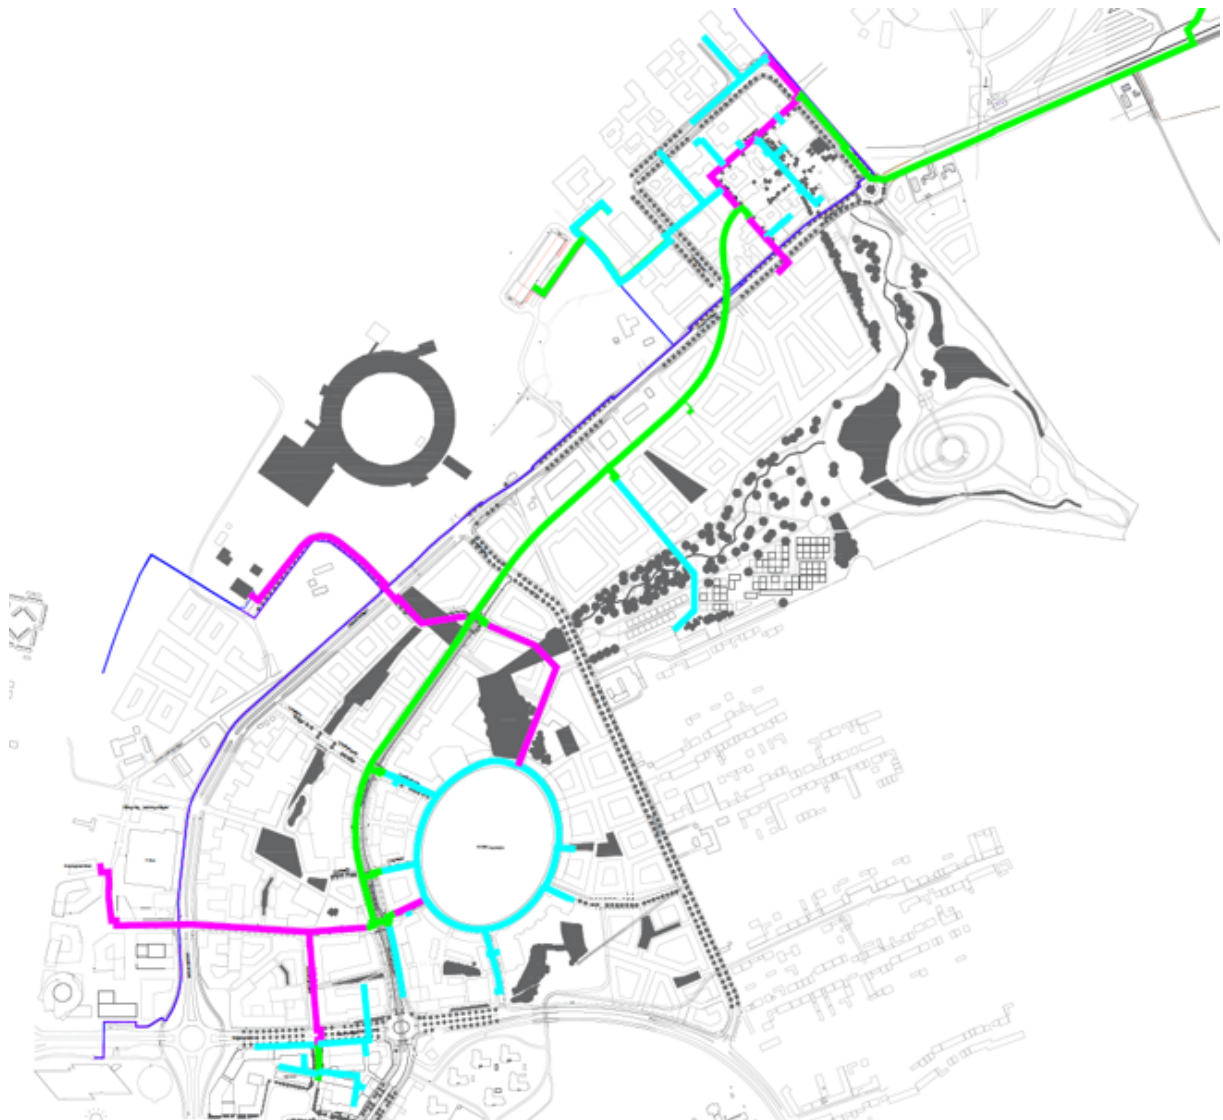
The current pipe layout in Brunnsjön. Green lines indicates finished steel pipes, purple lines indicated planned steel pipes and turquoise lines indicate planned plastic pipes Source: (Gierow and Falkvall, 2018).
